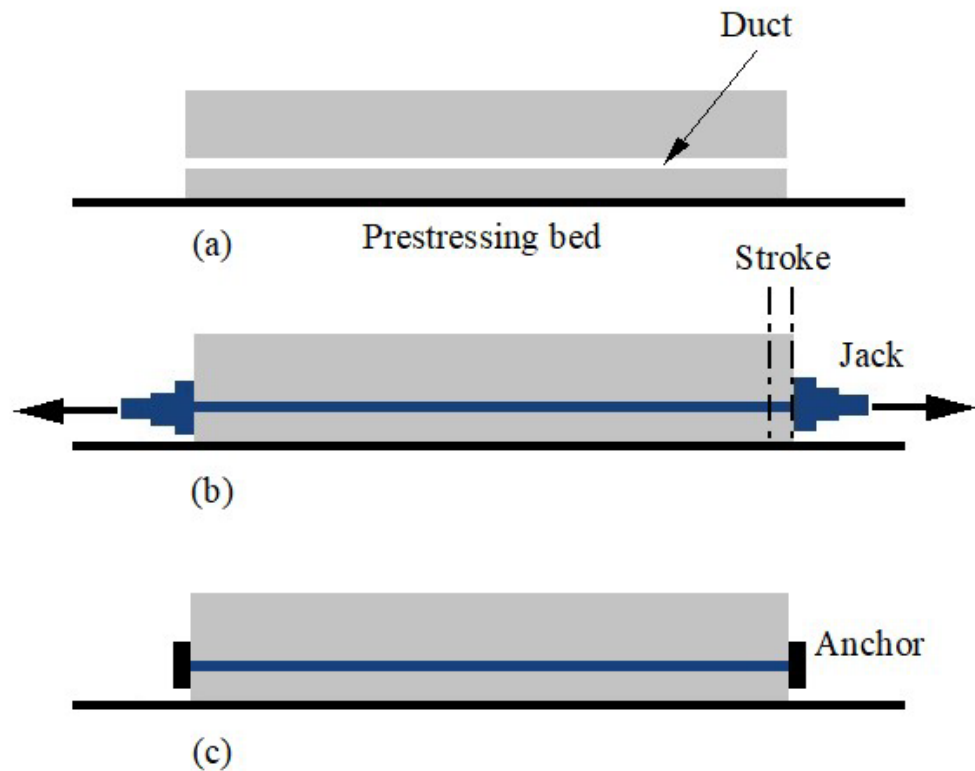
post-tensioning concrete procedure. (a) The casting of concrete with duct placed. (b) Tensioning the tendons in the duct. (c) Anchoring the tendons at the stretching ends.
